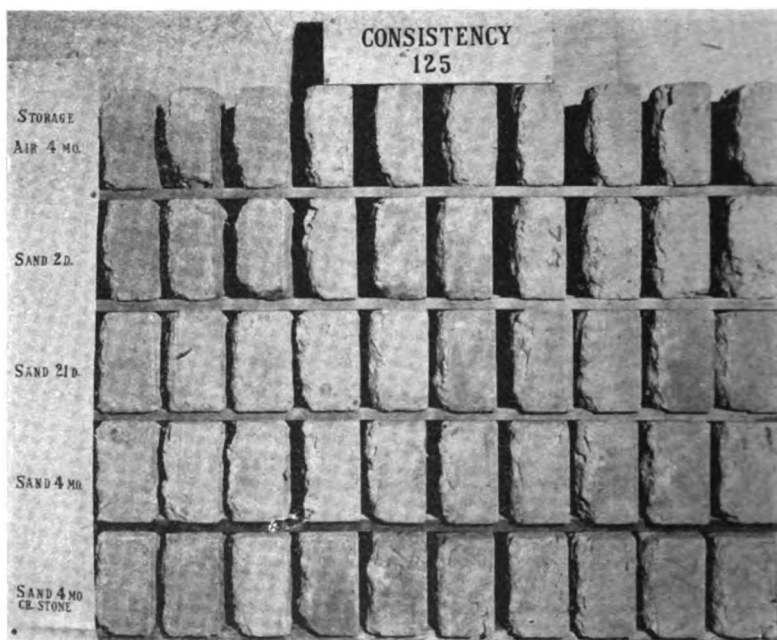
SIDE VIEW OF WEAR BLOCKS AFTER TEST.
